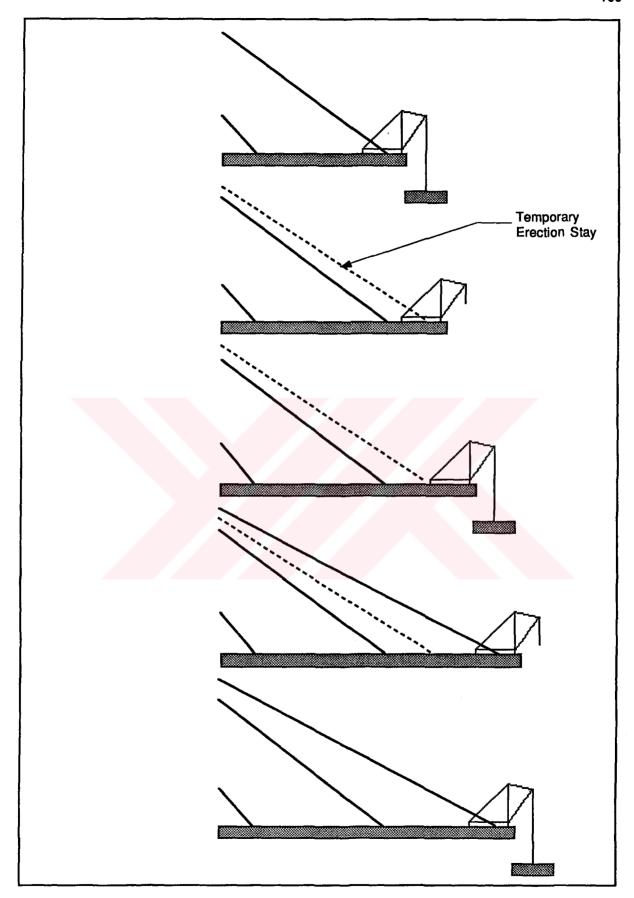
APPLICATION OF A TEMPORARY ERECTION STAY
